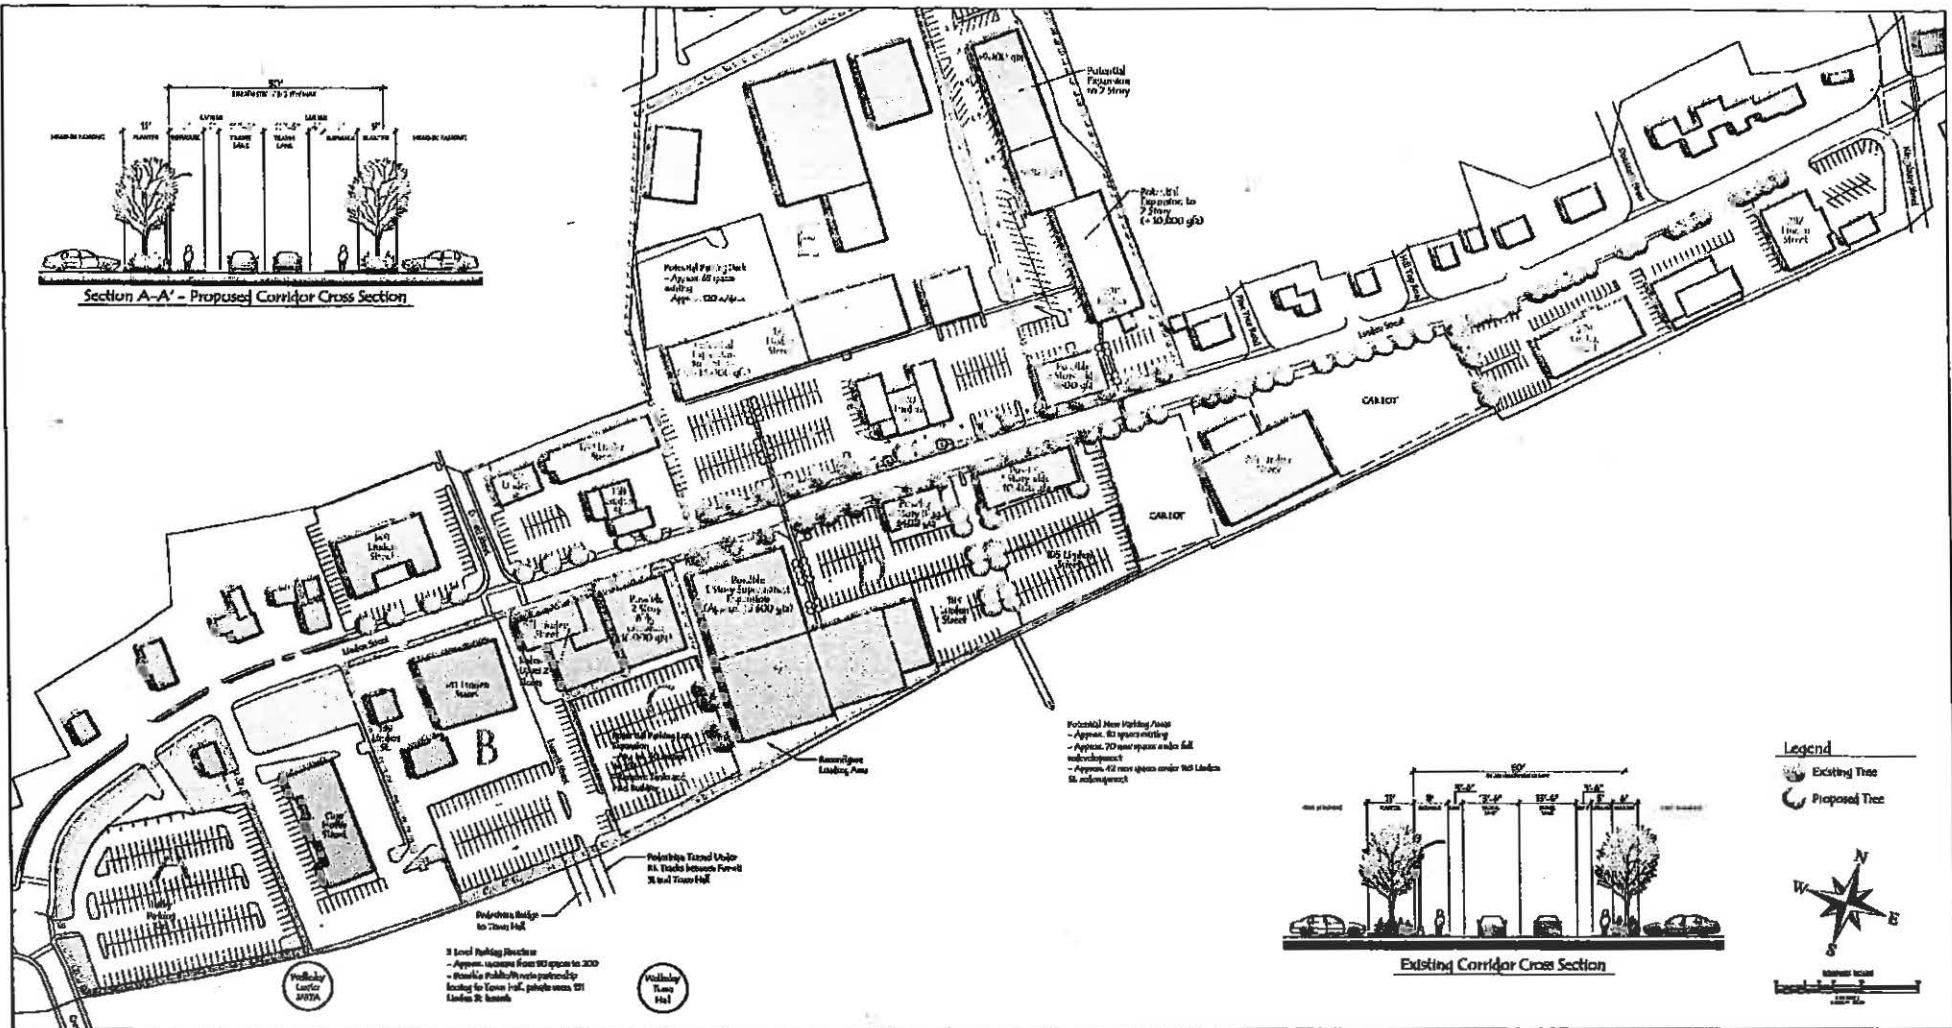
C: Linden Street Corridor Improvement Plan - Crest Road to Weston Road
